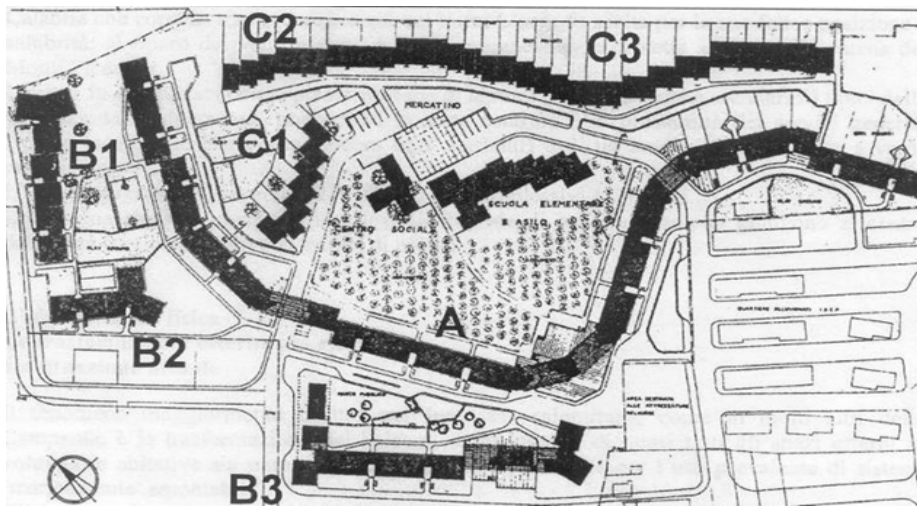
2: Quattiere INA CASA- Bruno Zevi, Salerno - Pastena -1955/61- Site Plan
